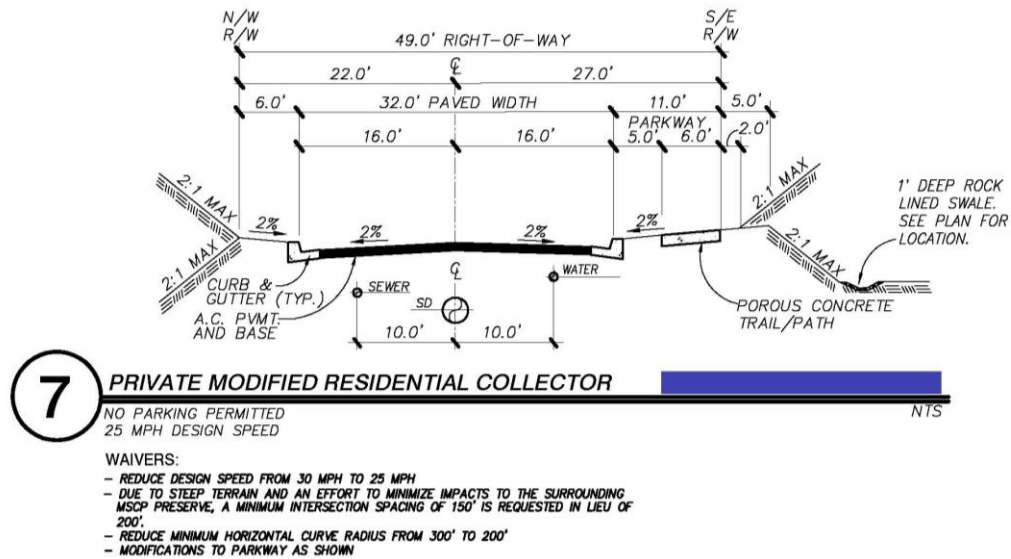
Street Section 7 - Modified Residential Collector (49' ROW)
